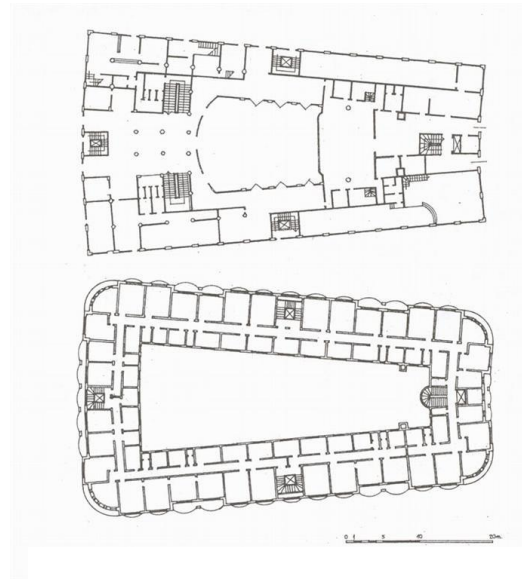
b. Ground and normal floor plans of the Second Pious Apartment.
